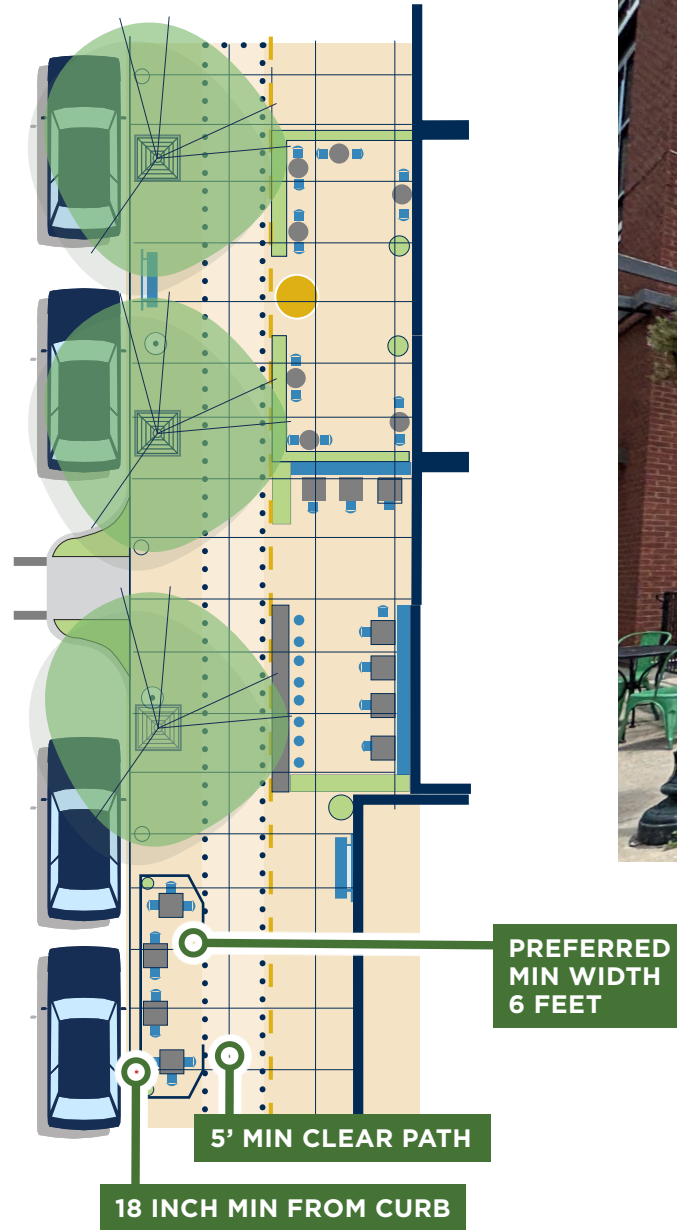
Sidewalk Cafes and Outdoor Seating
